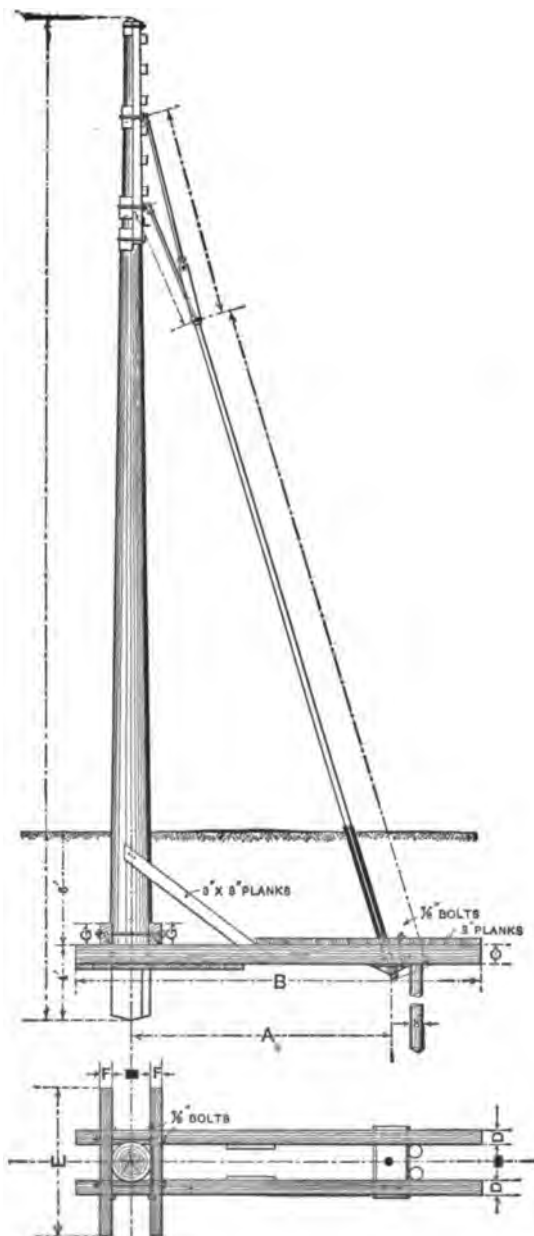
Plan and Elevation of Combination Anchor Pole.
